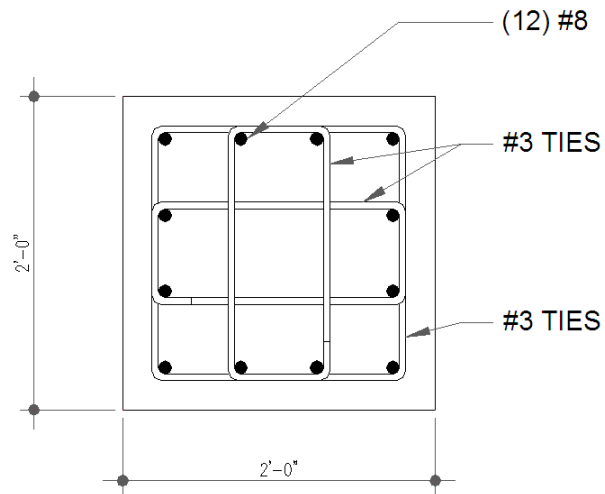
Detail of Typical Reinforced Concrete Column at Column Line 1.8
